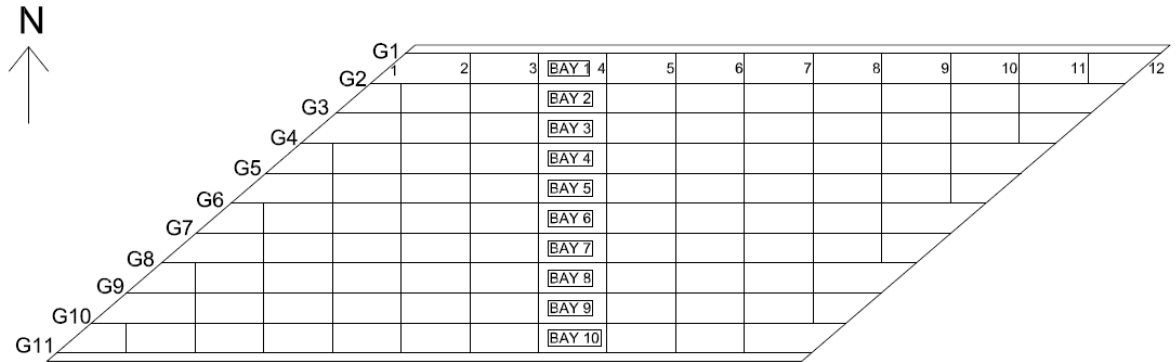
Girder, bay, and cross-frame numbering for Bridge 1.
